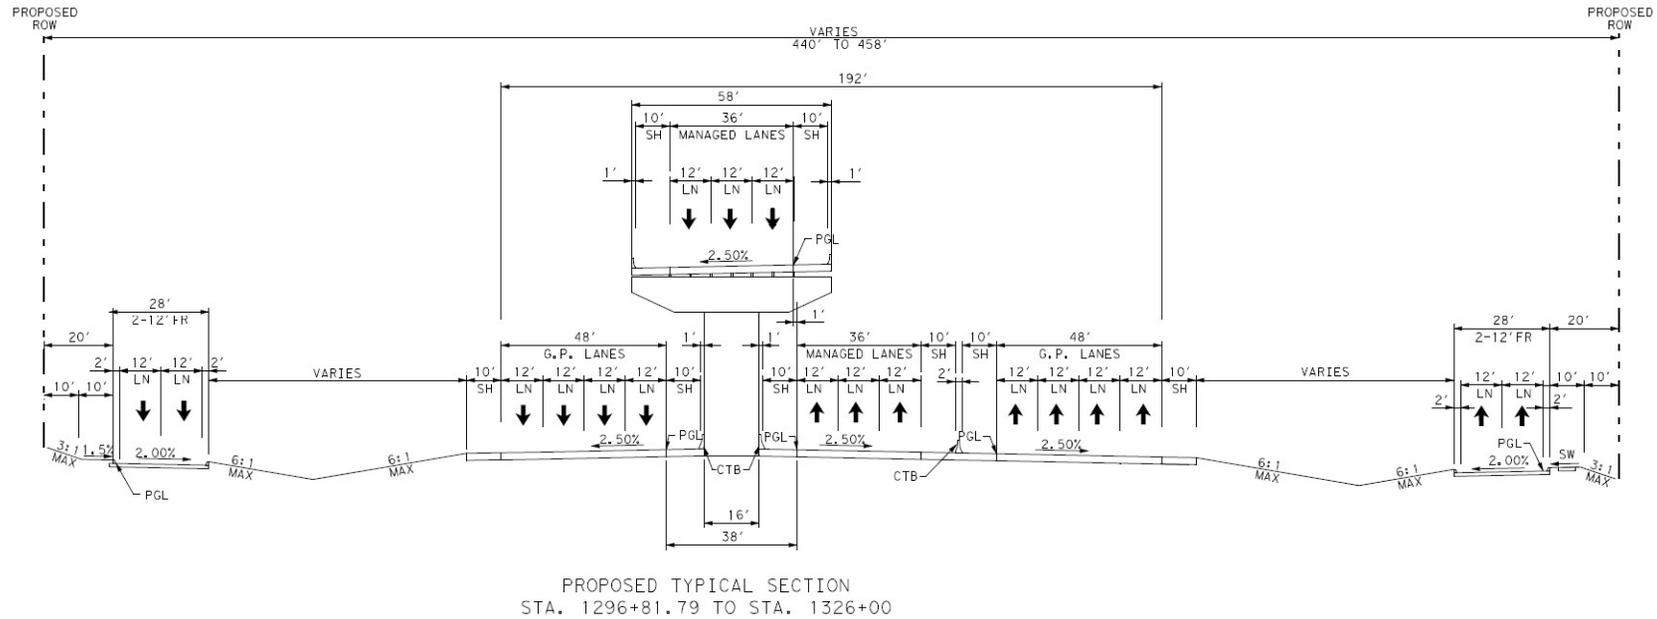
Typical Section - Segment 2E Interim Configuration
